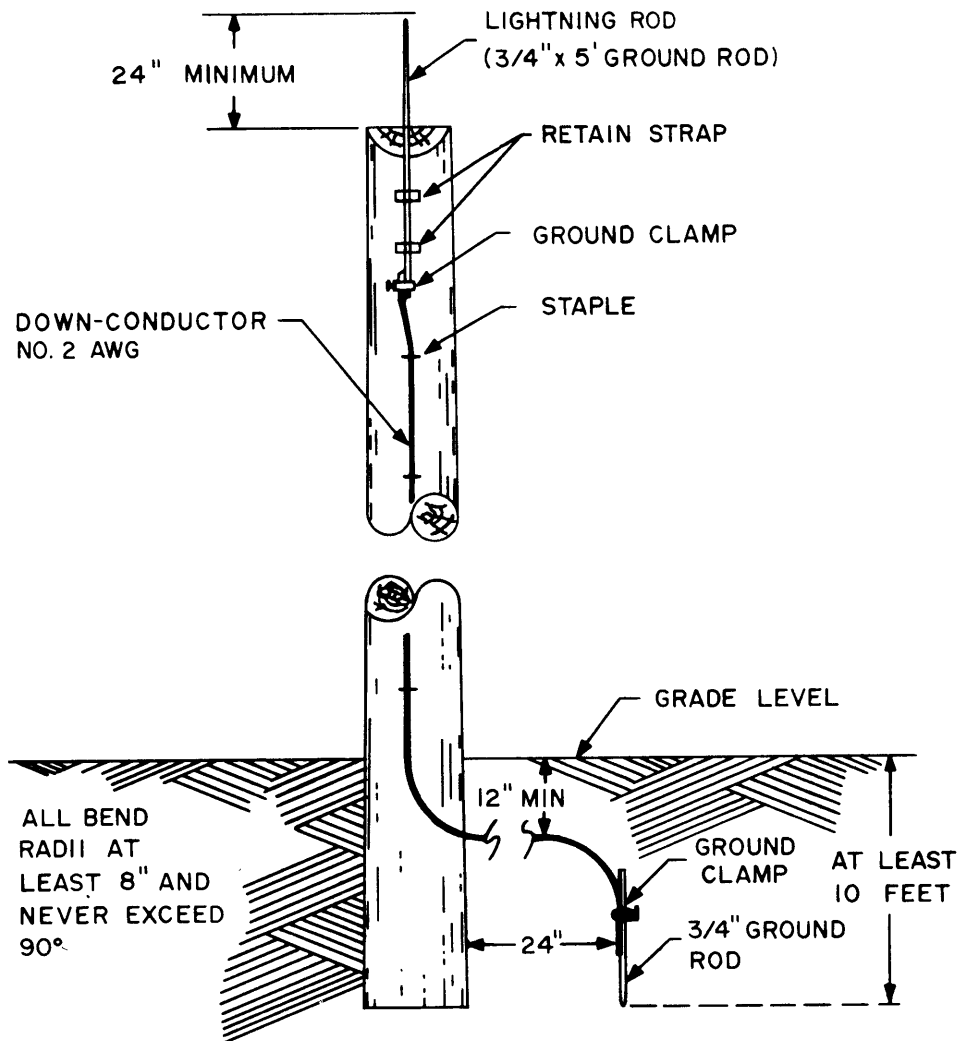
Typical Lightning Rod and Down-Conductor Arrangement
